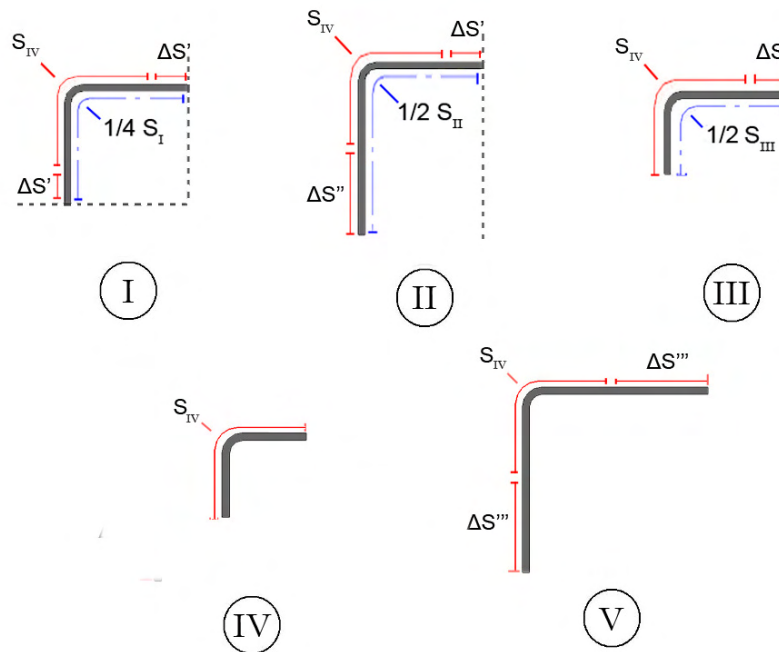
Subdivision of section length into a corner detail and portion of flat segments, for each of the five specimen cross-section geometries considered.
